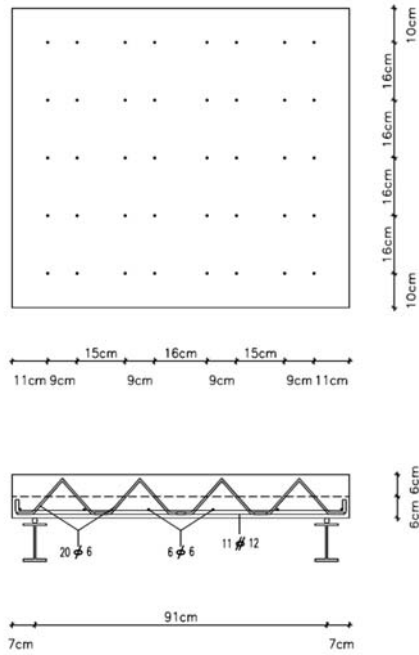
Typical dimensions and reinforcement of composite pre-slab (S23)
